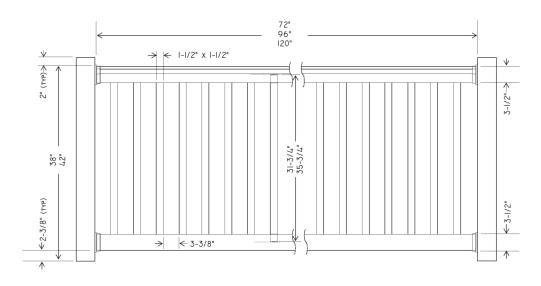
TYPICAL RAIL ASSEMBLY - AMERICANA SERIES
